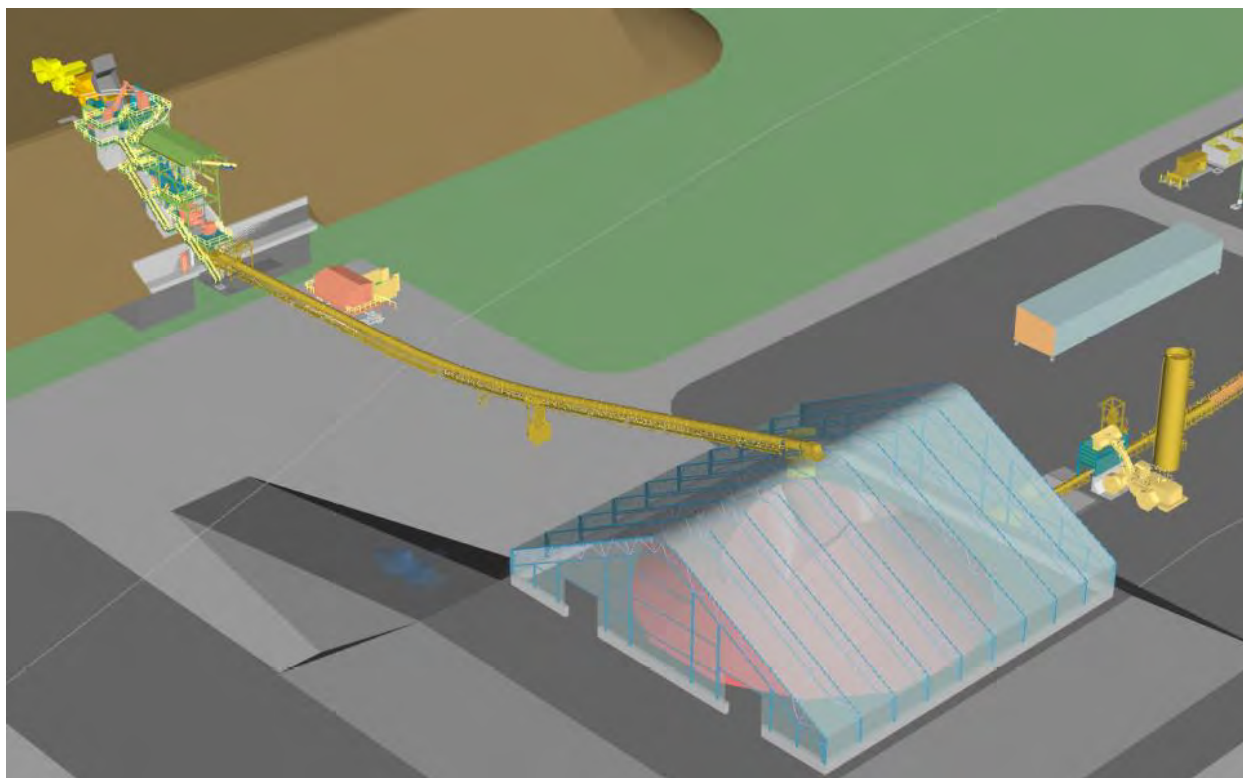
Primary Crushing and Mill Feed Stockpile
